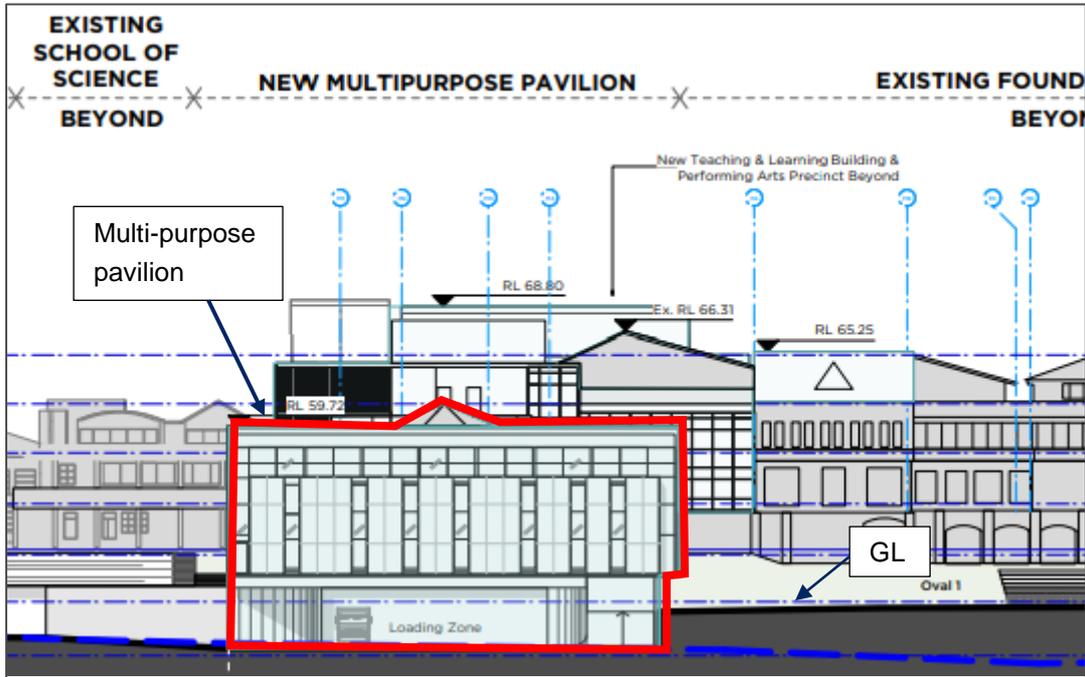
| Multi-purpose pavilion viewed from Yeo Park (Source: Applicant's SRtS 2021)
